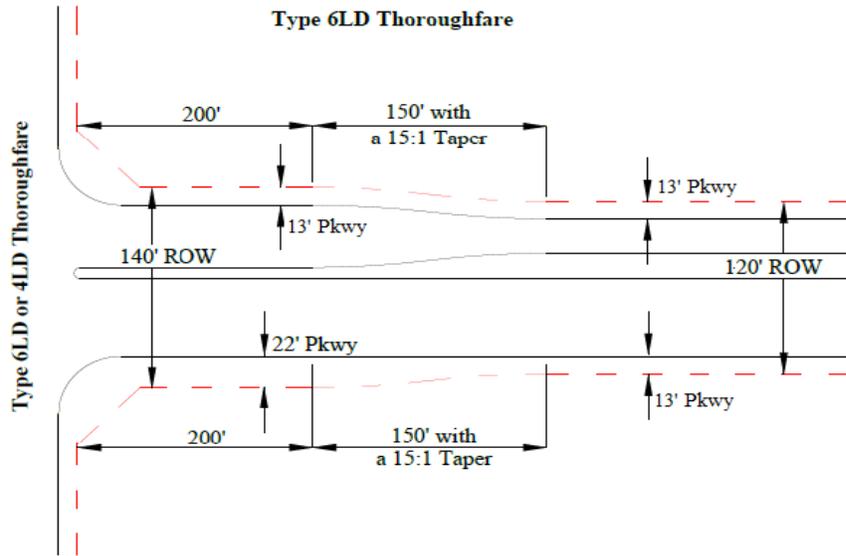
Type 6LD Thoroughfare Intersection Detail
